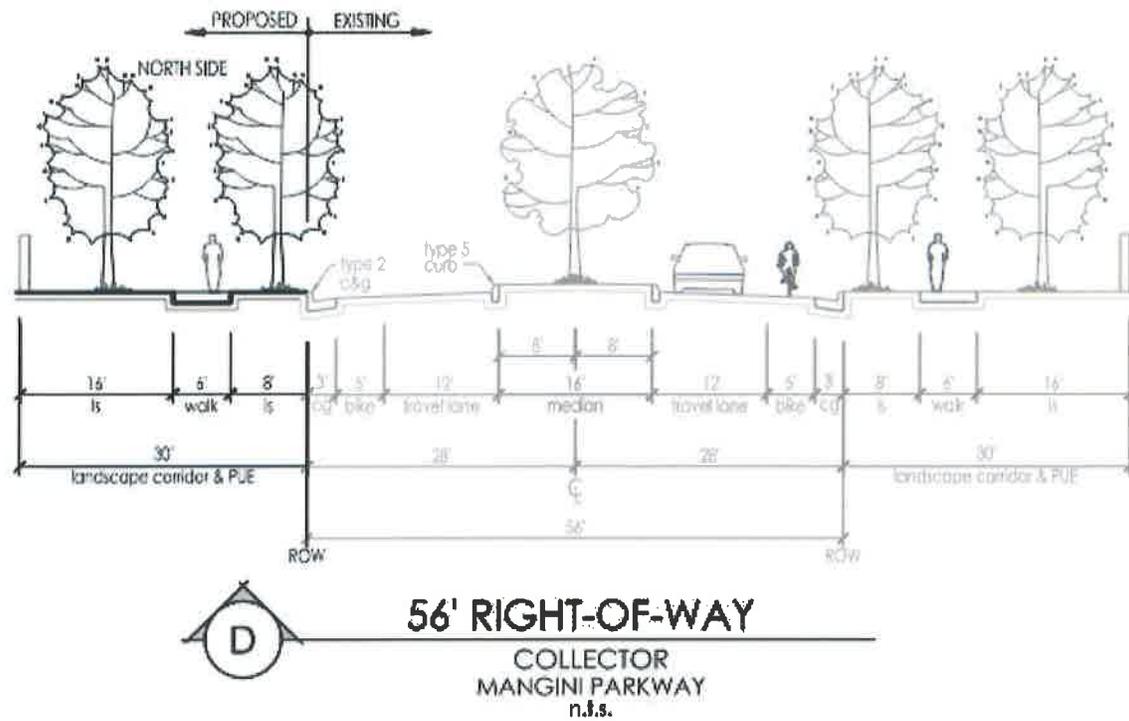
MANGINI PARKWAY CROSS SECTION
